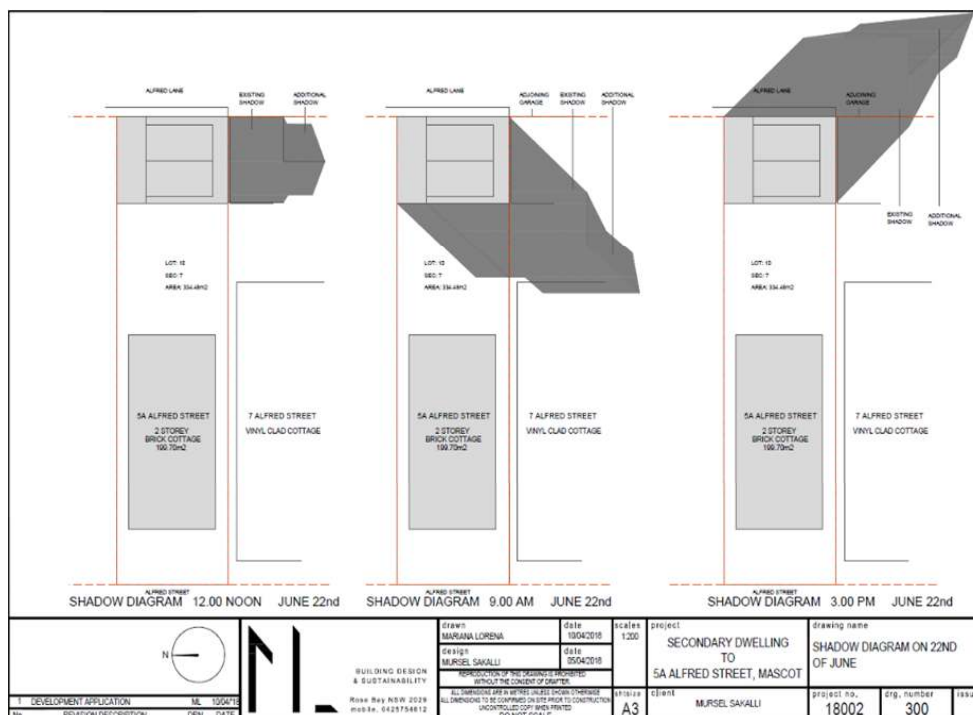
Approved Shadow Plans for the southern neighbour at 5A Alfred Street Mascot.
